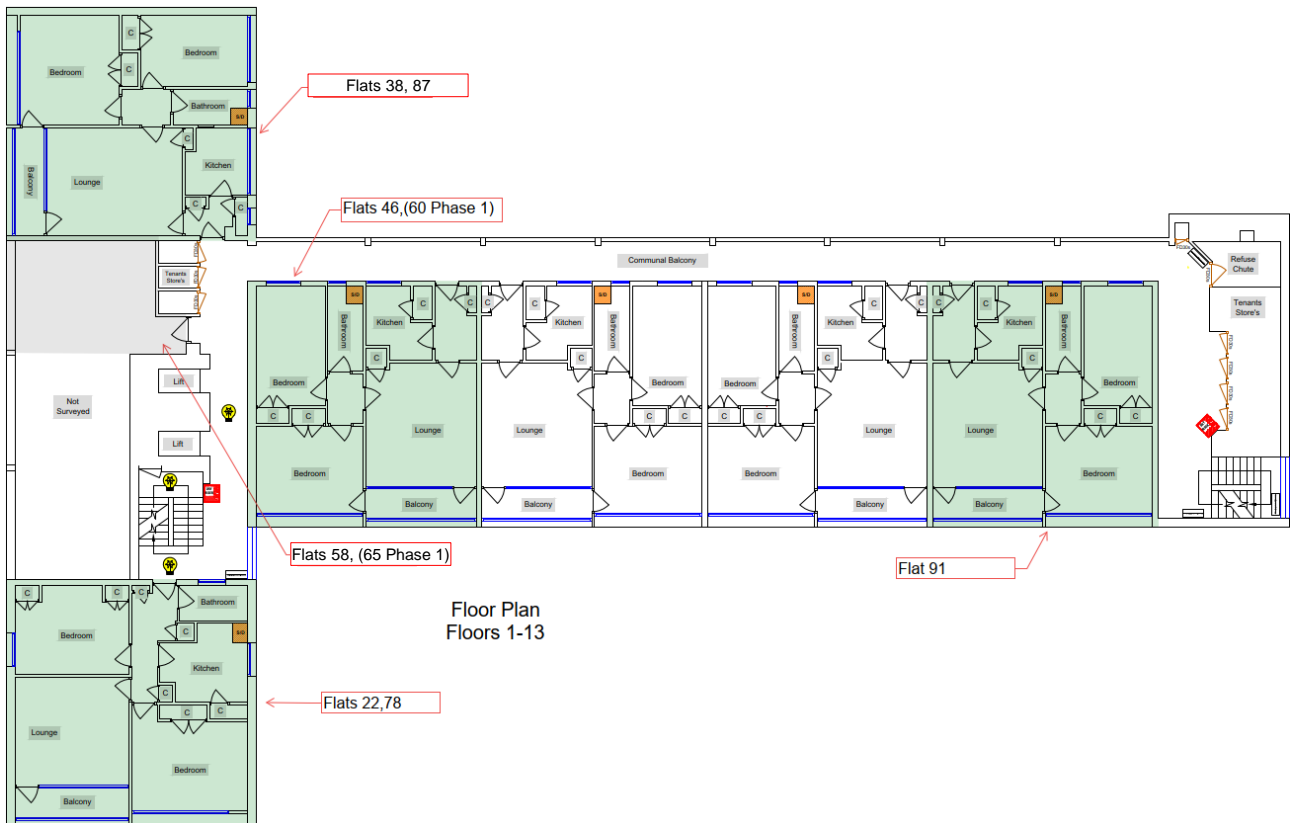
Typical plan view of Barton House, Phase 1 and 2 intrusive investigation locations.
